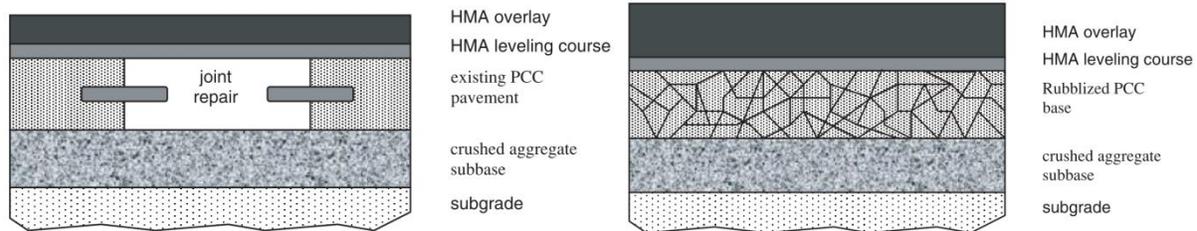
Examples of AC overlays to rehabilitate existing rigid pavements, here for a repaired PCC slab (at left) and rubblized PCC pavement (at right) (from Christensen and Bonaquist 2011)
